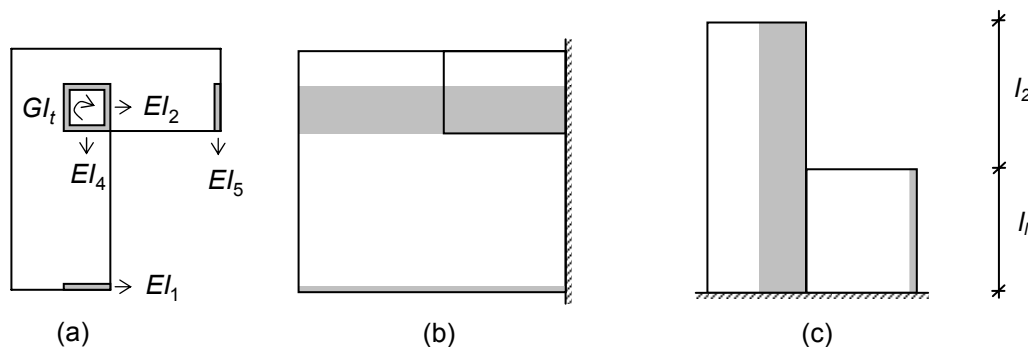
Ground plan (a), side view (b) and front view (c) of the asymmetric structure.
